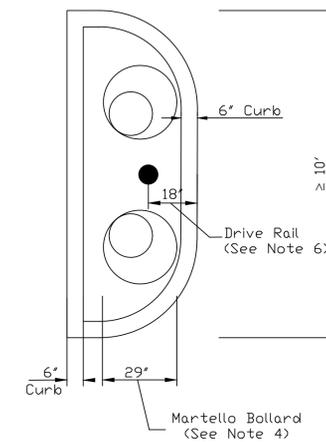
6' Width Island Plan w/o Detectable Warning Mat
